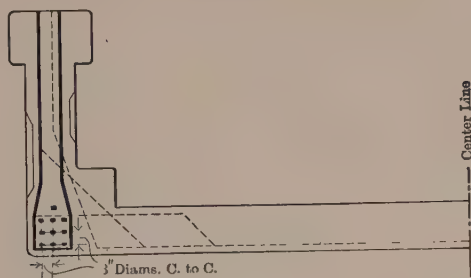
Reinforced Concrete Girder Bridges. Illinois Highway Commission.
